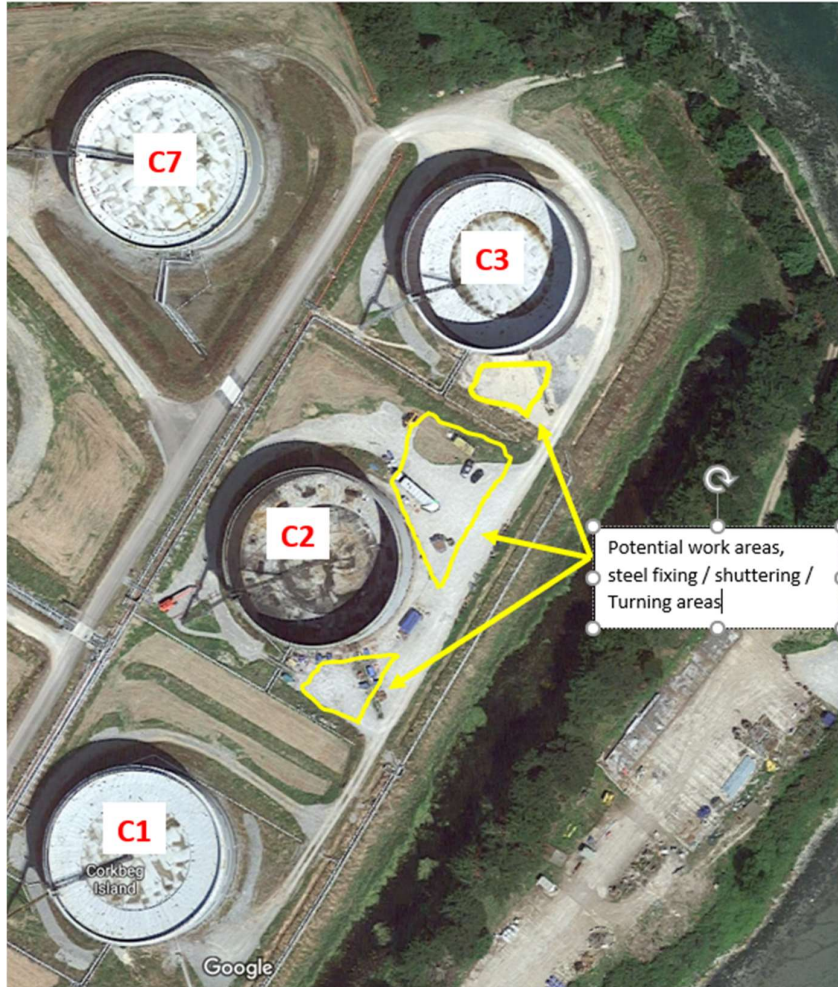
Potential areas for assembling rebar cages / shuttering adjacent to new pipe supports
